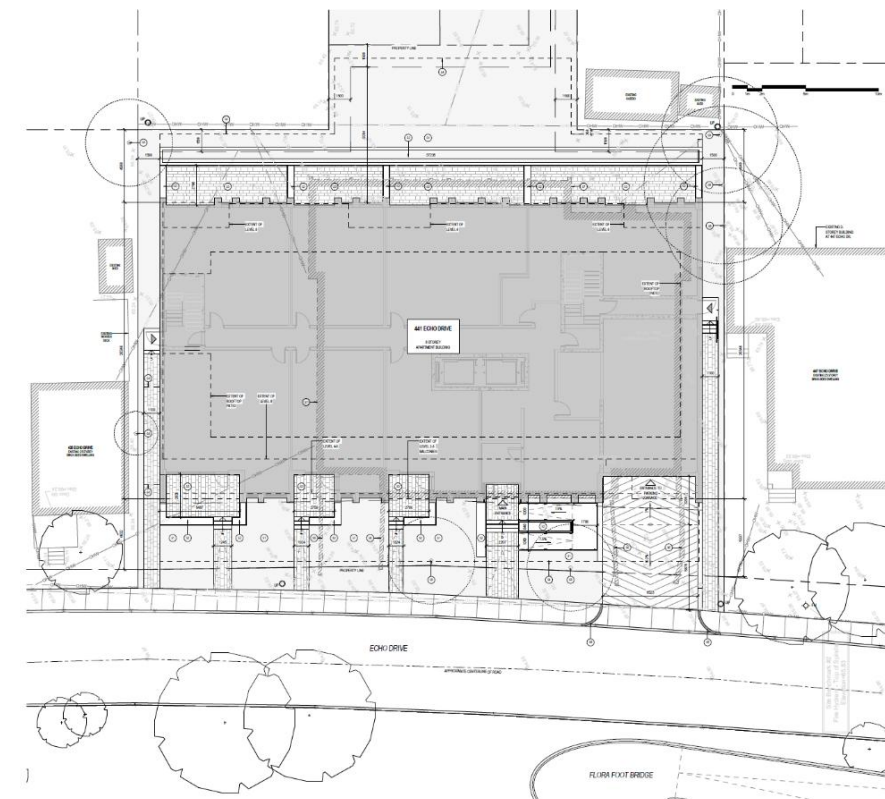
Site plan of 441 Echo Drive (Source: Project1 Studio)
